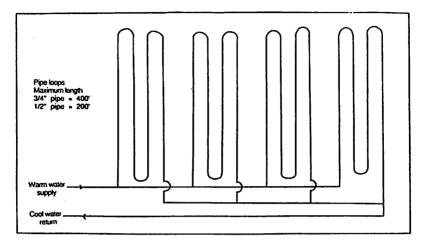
Typical pipe layout for floor or bench heating (reverse return).
